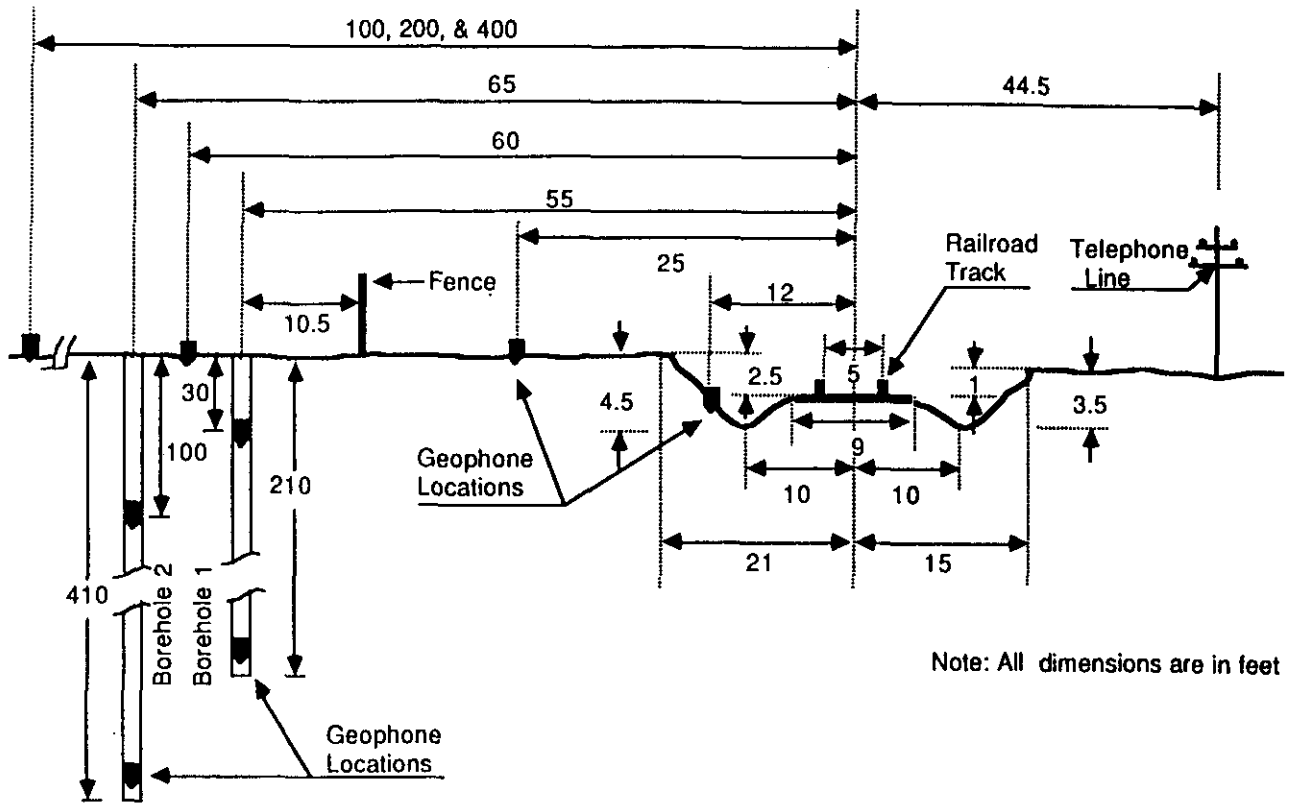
Cross Sectional View of Railroad Track and Vibration Measurement Locations
